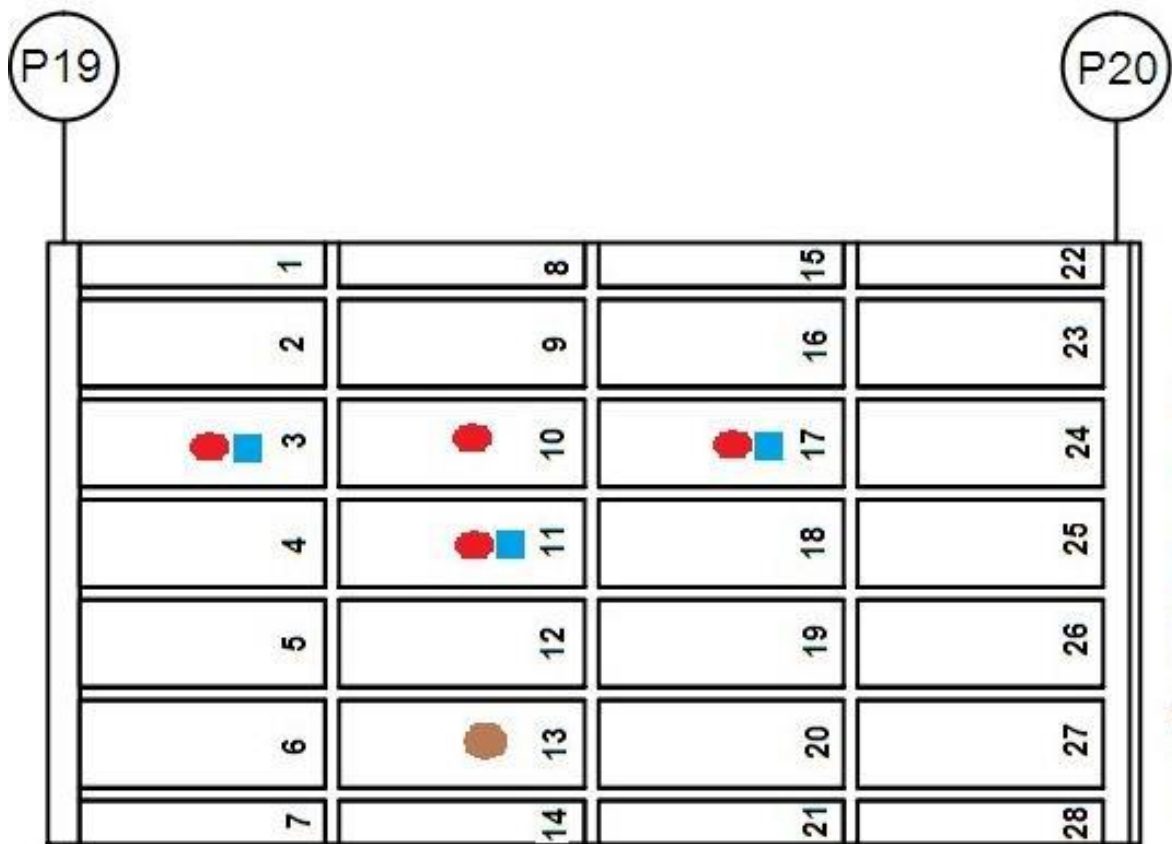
Test conducted at various locations between Pier P19 and Pier P20
